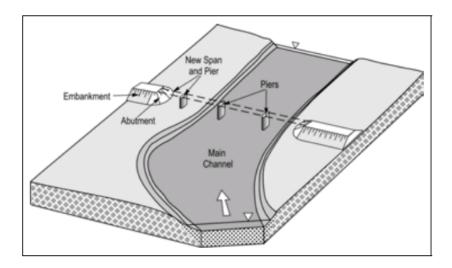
, Bridge channel widening (Ettema et al. 2006)
